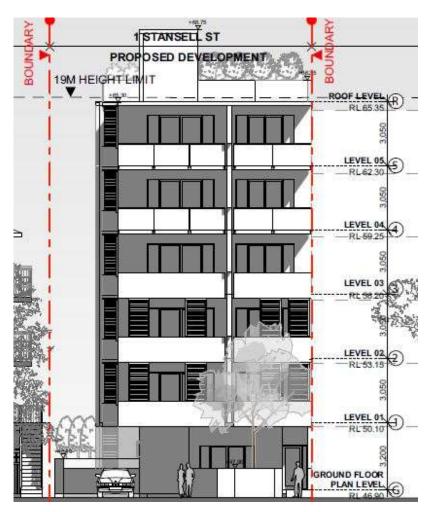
Stansell Street elevation. The lift overrun is setback 23.5m from Stansell Street and is unlikely to be seen from the street.
